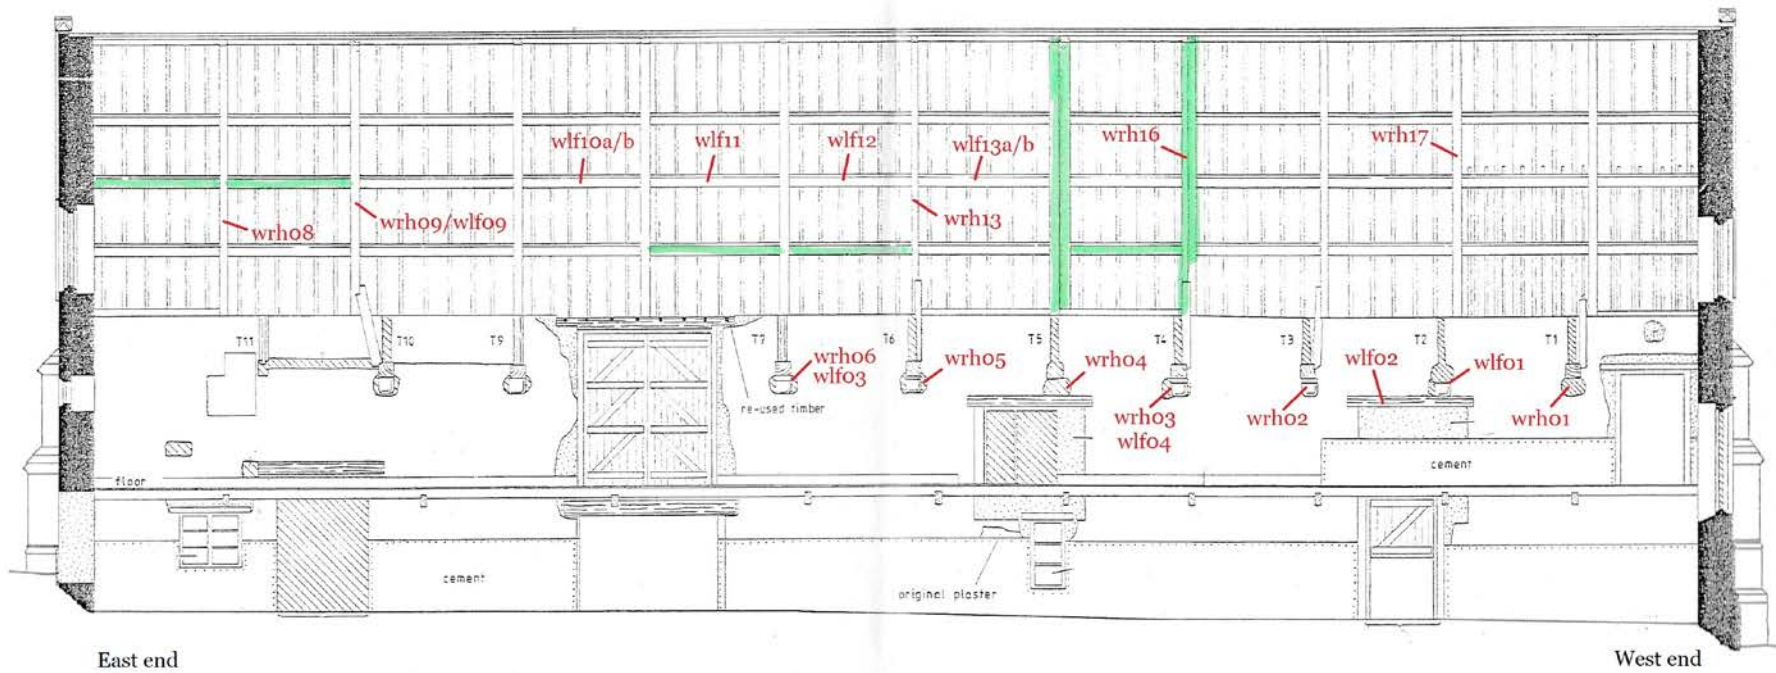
Drawing of the interior elevation of the south wall and roof (looking south) showing the timbers sampled for dendrochronology, (floor beam 8, wrh07 is not shown) adapted from an original by Philip Hughes Associates. The timbers marked in green were thought possibly to be re-used primary timbers
